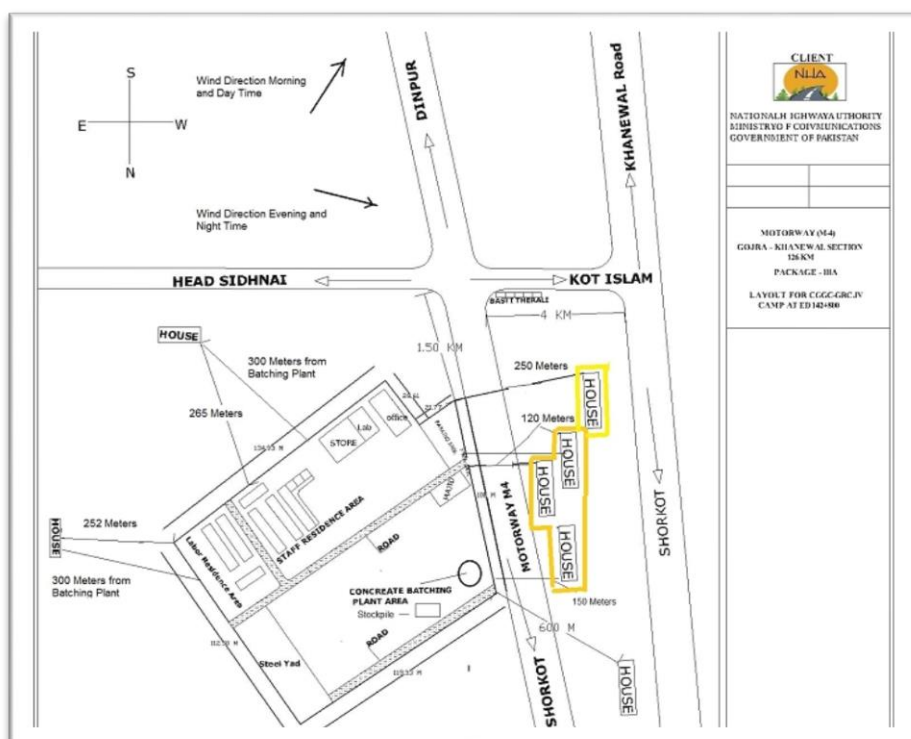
Lay out plan of camp site showing affected households to be dislocated temporarily.
